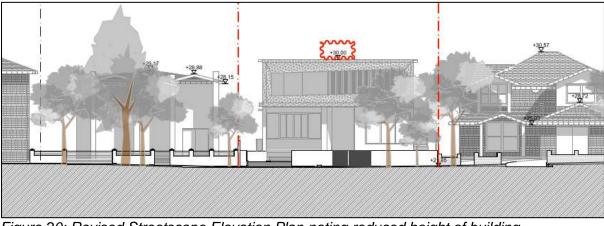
Revised Streetscape Elevation Plan noting reduced height of building.
